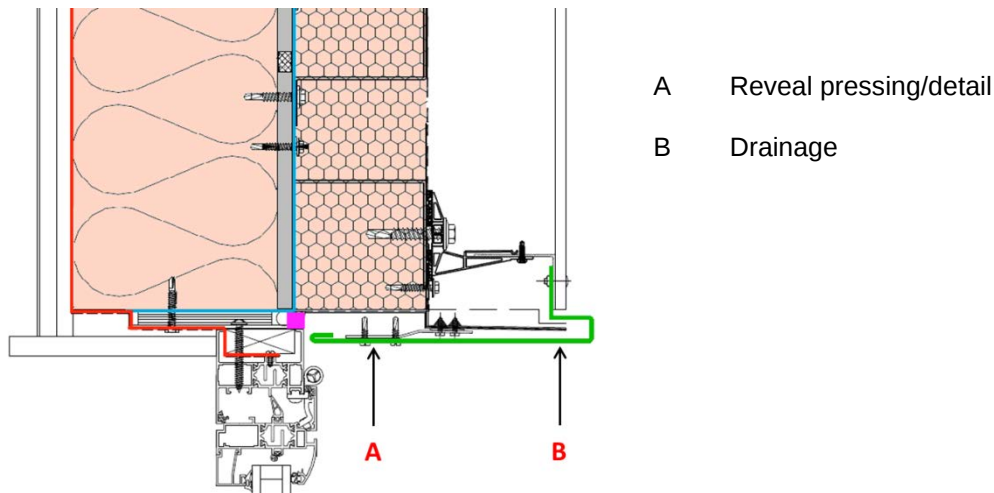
Window head interface with rainscreen, framed back wall (insulated)
